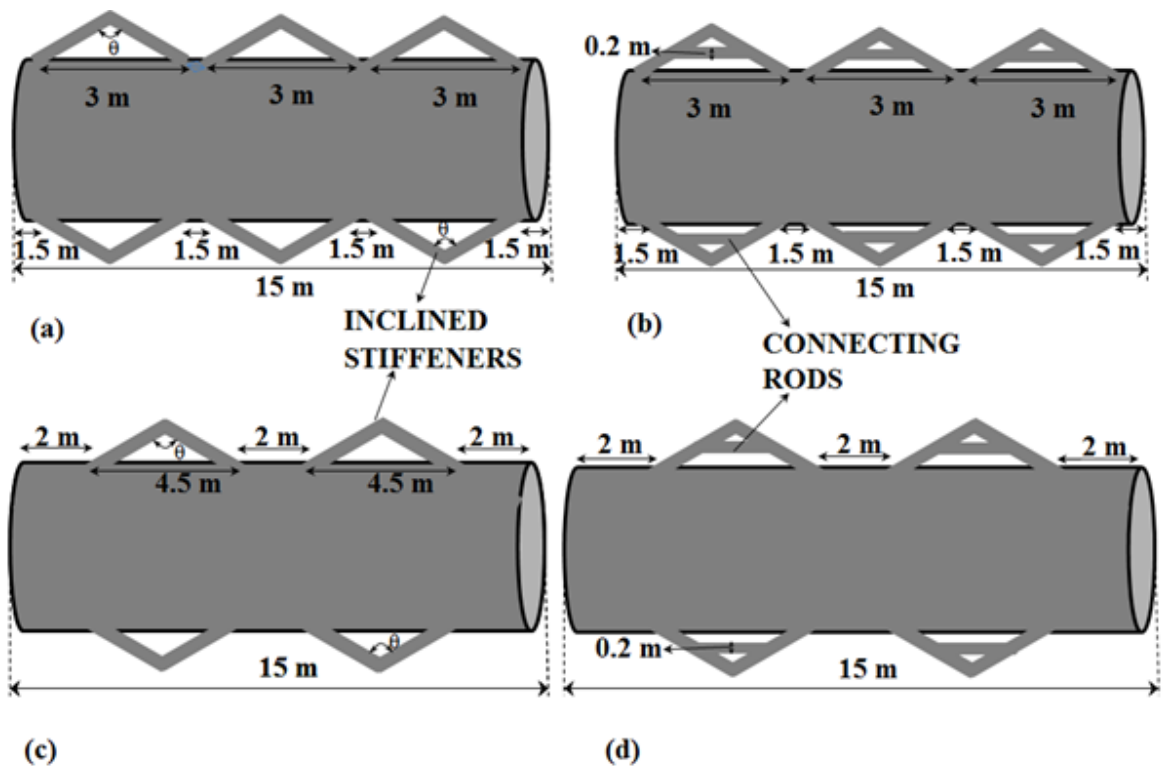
Cross-sections of a pipe models with inclined stiffener configurations (a) & (c) and inclined stiffener configurations with connecting rods (b) & (d).
